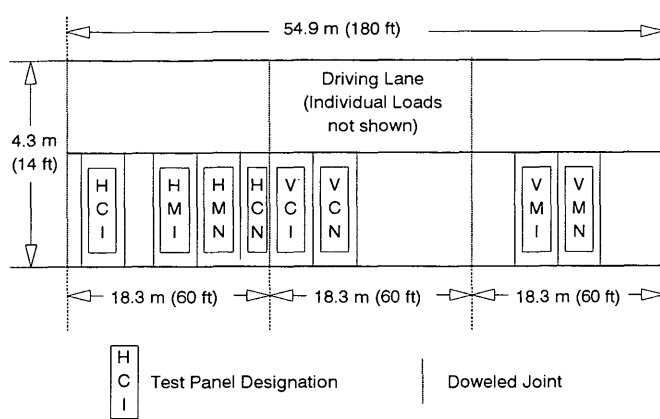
SHRP C-205 field installation layout, North Carolina.
